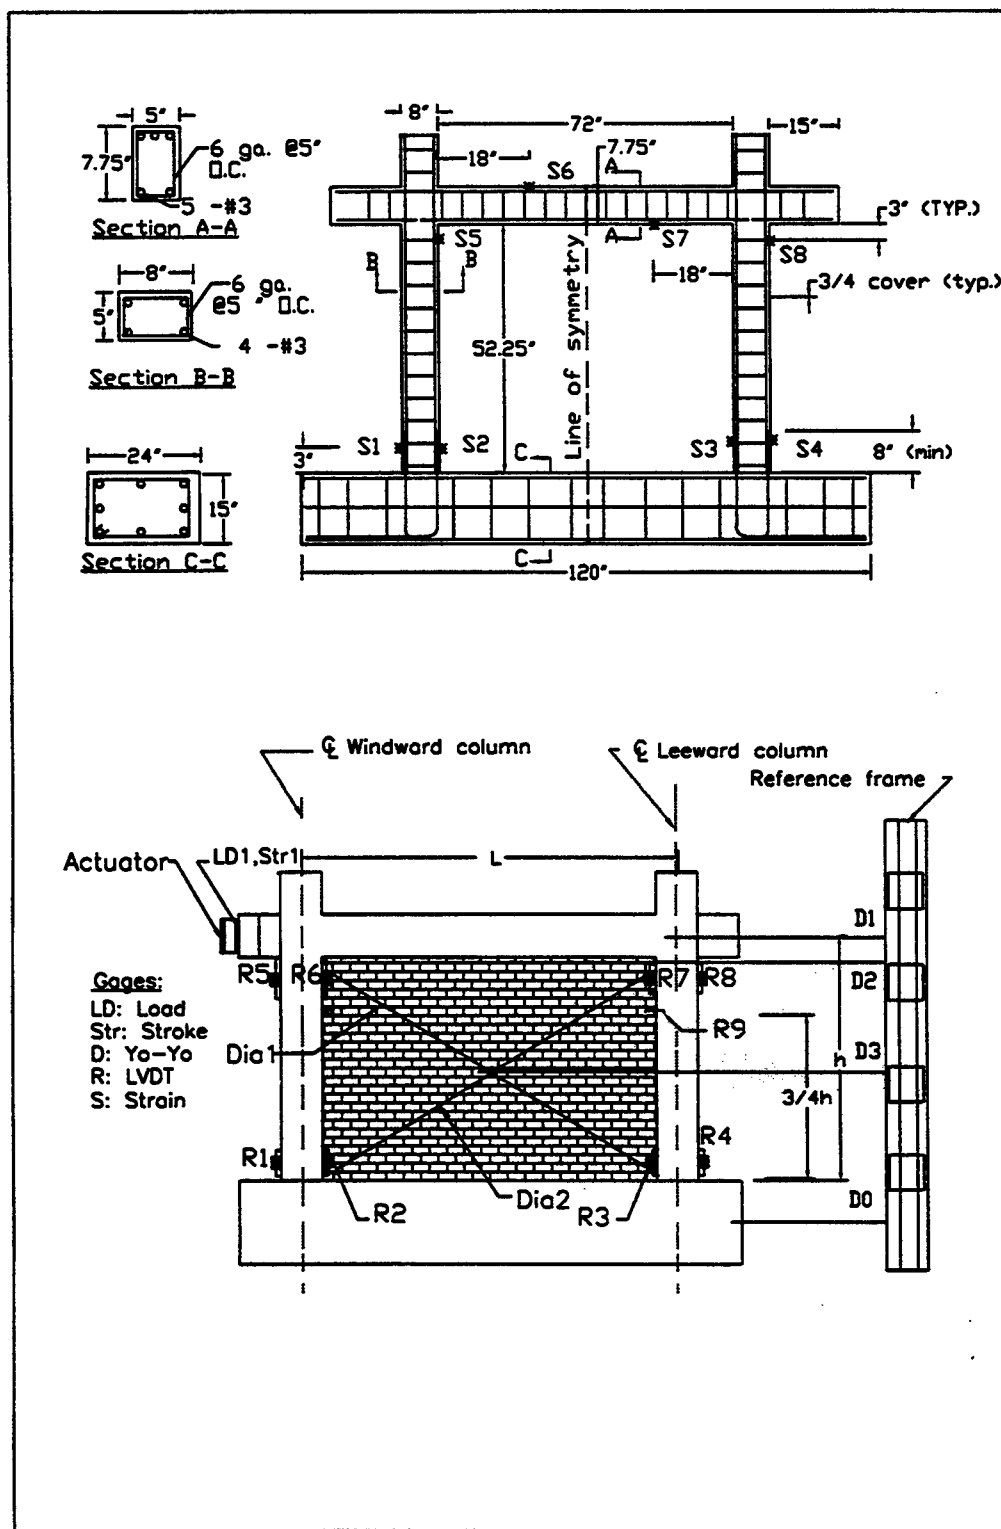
Reinforcement Details and Instrumentation Plan for the One-Bay Brick and CMU Infilled Specimens (Models 2 and 3)
